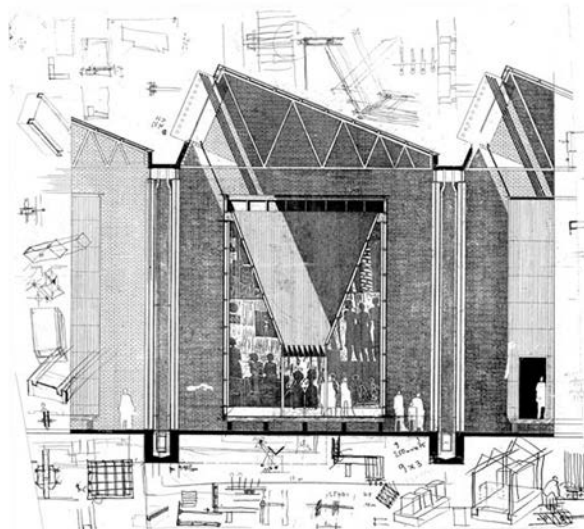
Red Location sectional detail (Adopted by Author 2018)
